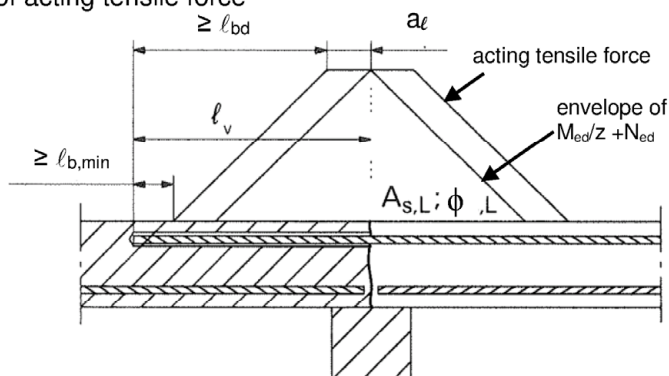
Overlapping joint for rebar connections of slabs and beams
